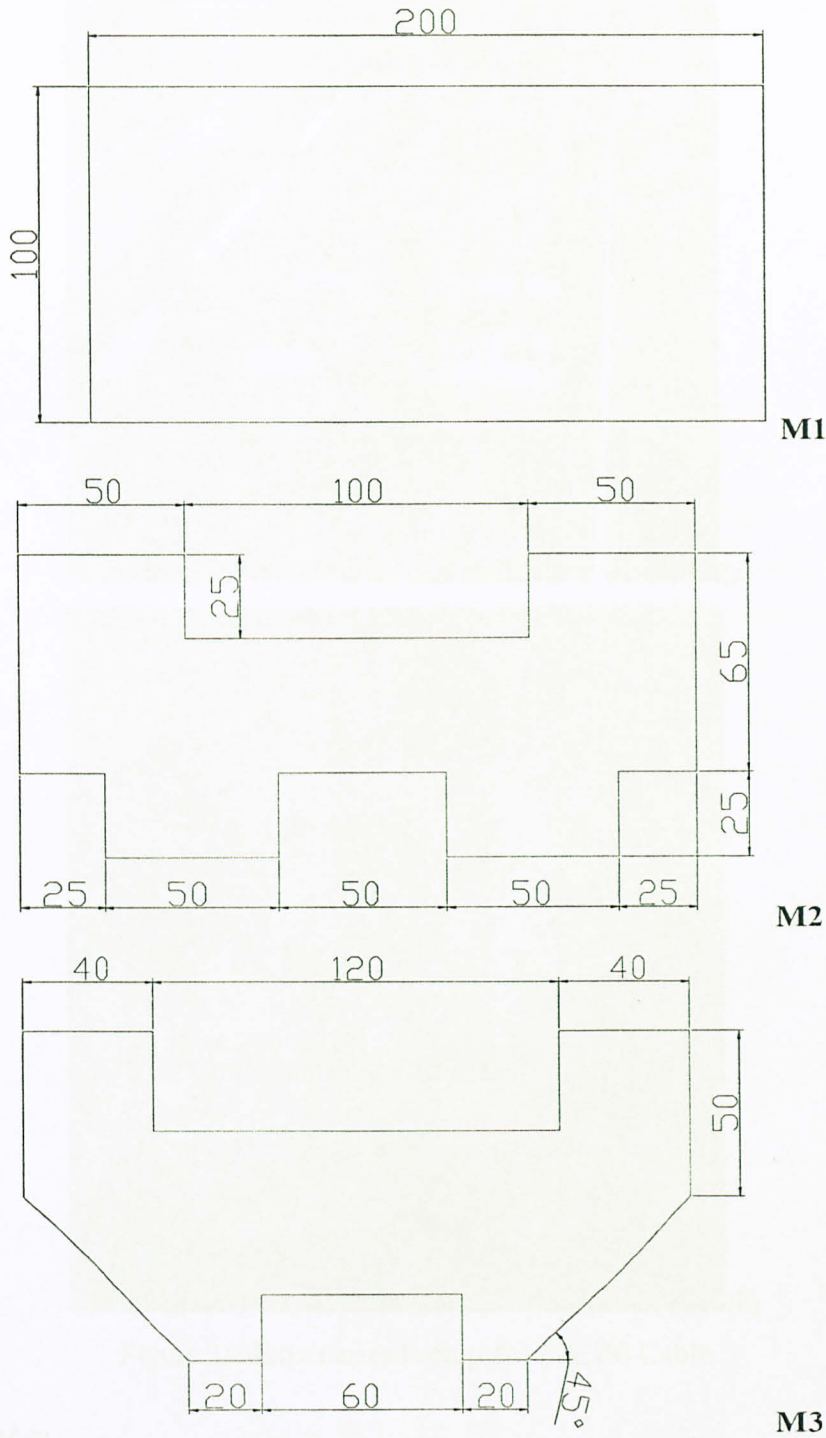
Section view of floating breakwater models (dimensions unit: mm)
